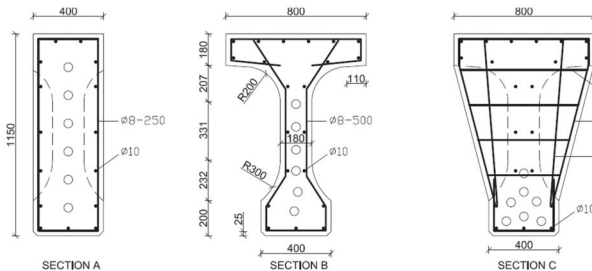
Cross-section of girder at anchorage block (section a), of girder (section B, showing reinforcement details) and at cross-beam (section C). Sections as indicated in Figure 8. Dimensions in mm. (Ensink et al., 2024).
